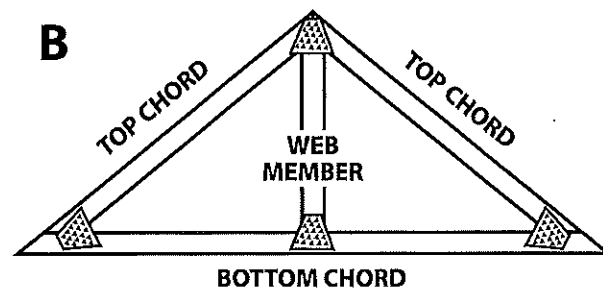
B. When a single web member is added to a planar truss, it becomes a king post truss.
